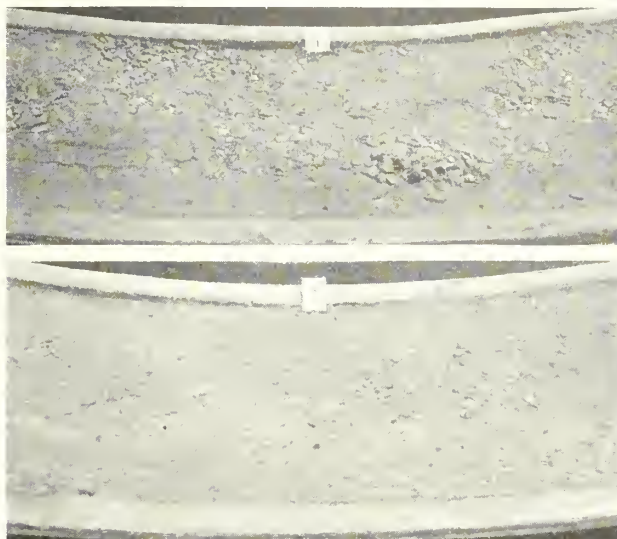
SECTIONS OF TRACK 3 AT 160,000 WHEEL-TRIPS, JUST BEFORE THE FIRST SPRINKLING. UPPER, SECTION 1, WHICH IS ALSO REPRESENTATIVE OF SECTION 2; LOWER, SECTION 3. SECTIONS 4 AND 5 WERE IN SLIGHTLY BETTER CONDITION THAN SECTION 3.
